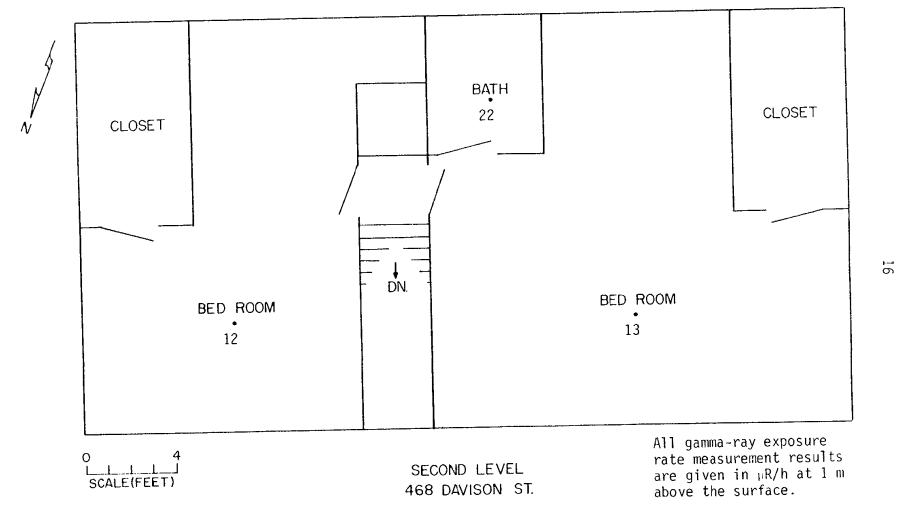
Schematic of the second level floor plan at 468 Davison Avenue showing external gamma-ray measurement results
